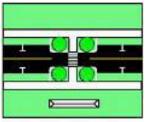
Schematic of a bulb-out with parallel parking and a crosswalk.
